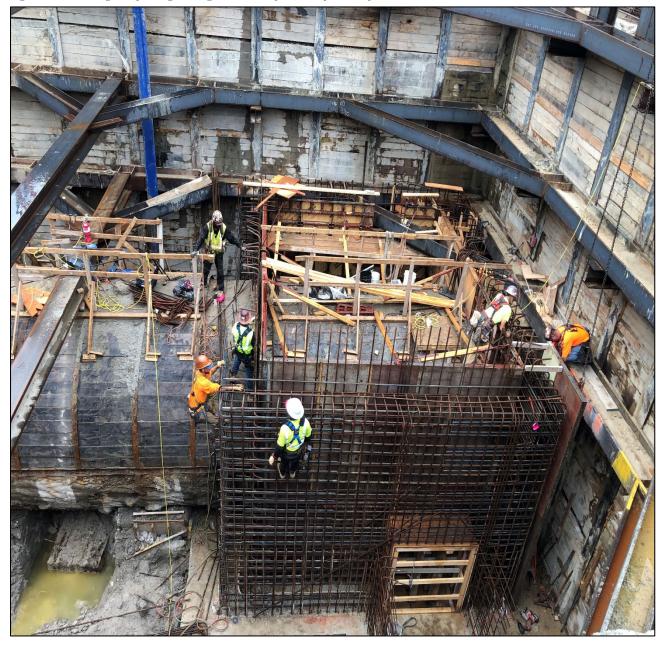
Installed Concrete Wall Forms @ West Wall of Beaconsfield Shaft
